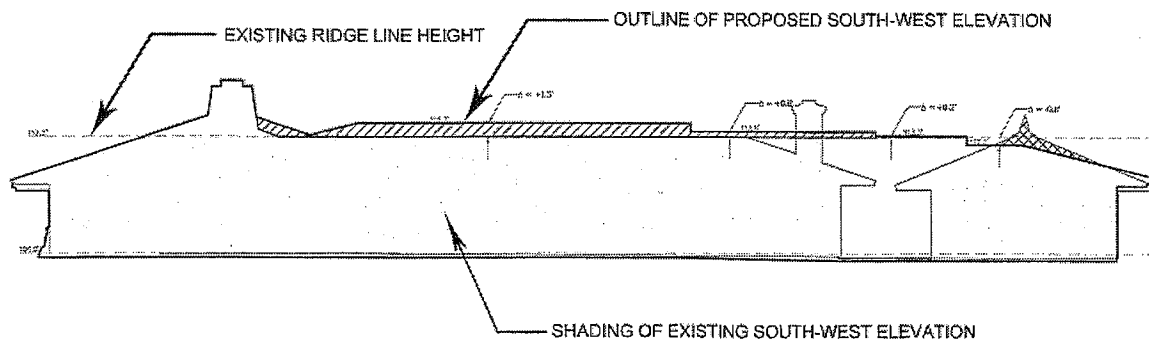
Southwest Elevation Silhouette (Source: IX.23)
